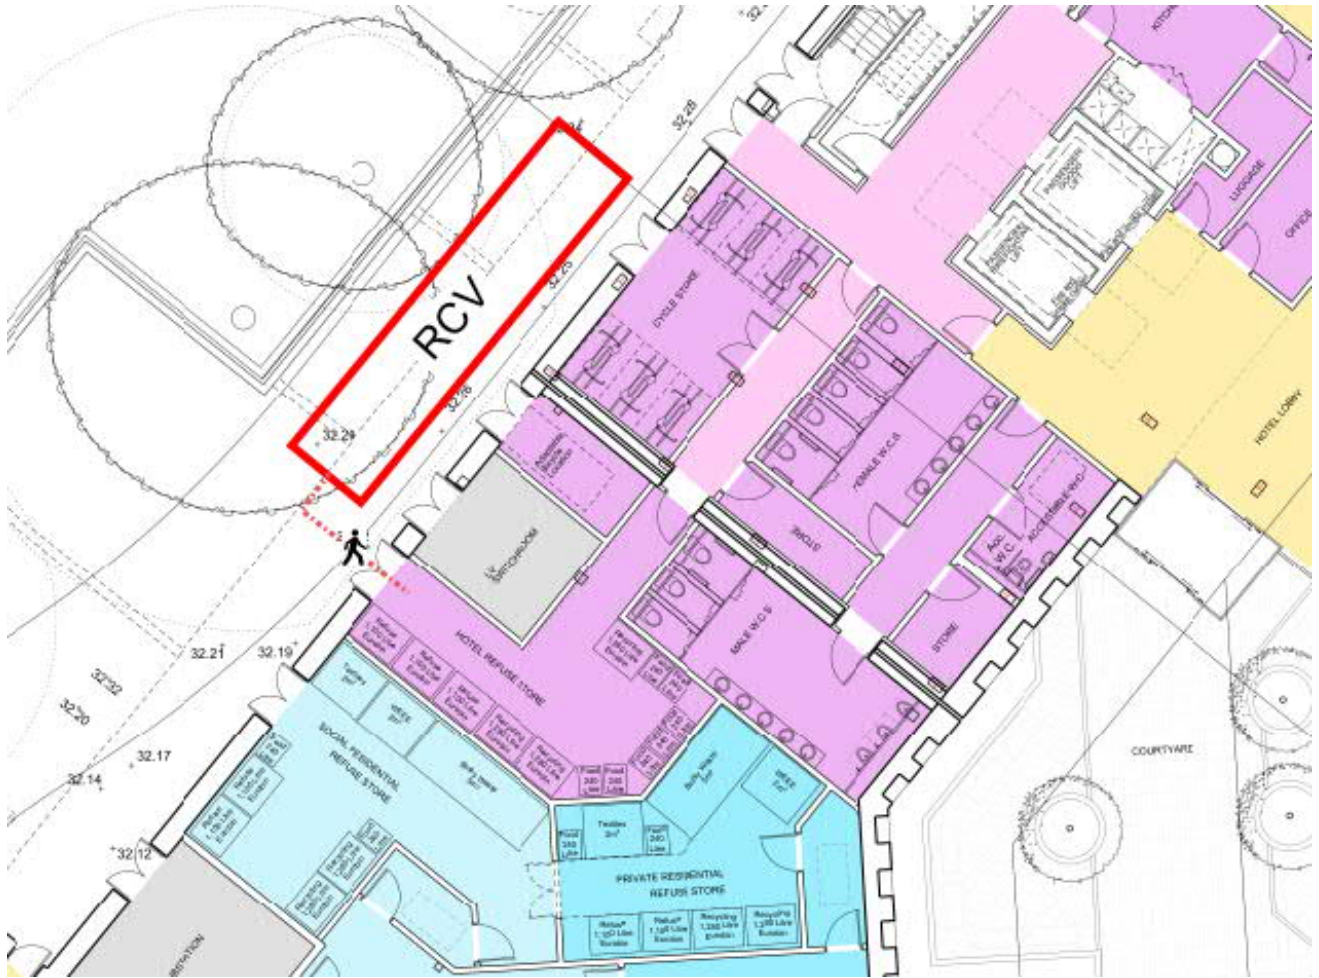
Location of the Hotel’s Waste Storage Area
